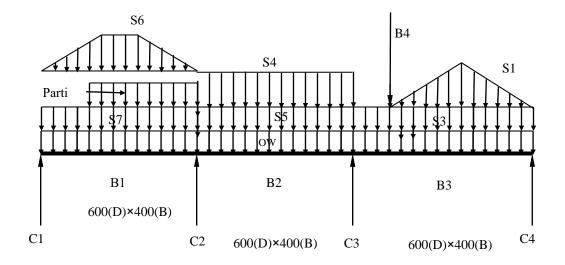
Loading Diagram on Beam B1-B2-B3.
